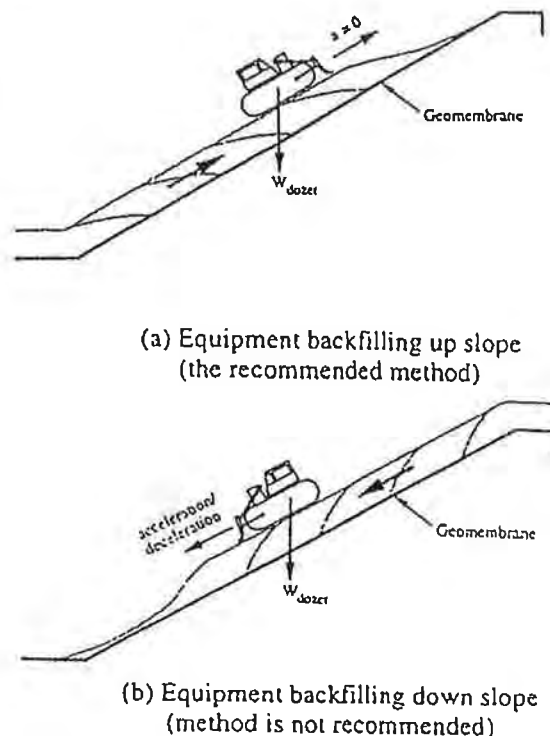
Construction equipment placing cover soil on slopes containing geosynthetics.
